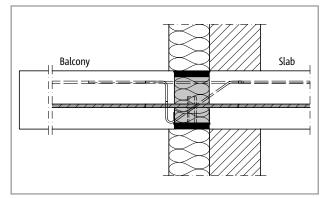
Schöck Isokorb® XT type K, H-NN: Masonry with external insulation
